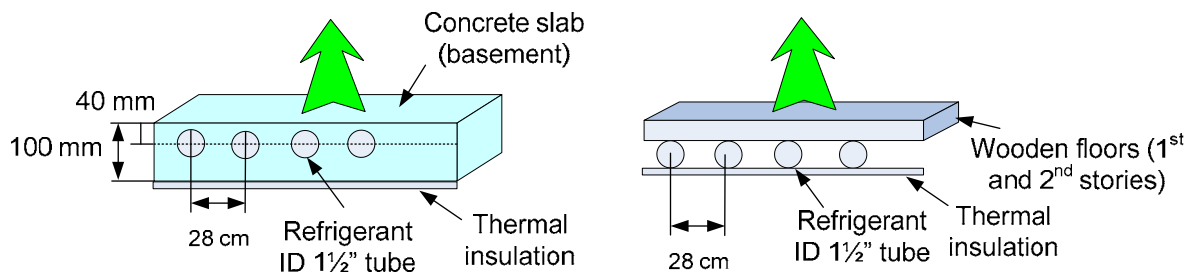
Emplacement of direct condensing tubes on basement (concrete slab), and 1st and 2nd floors (wooden panels)
